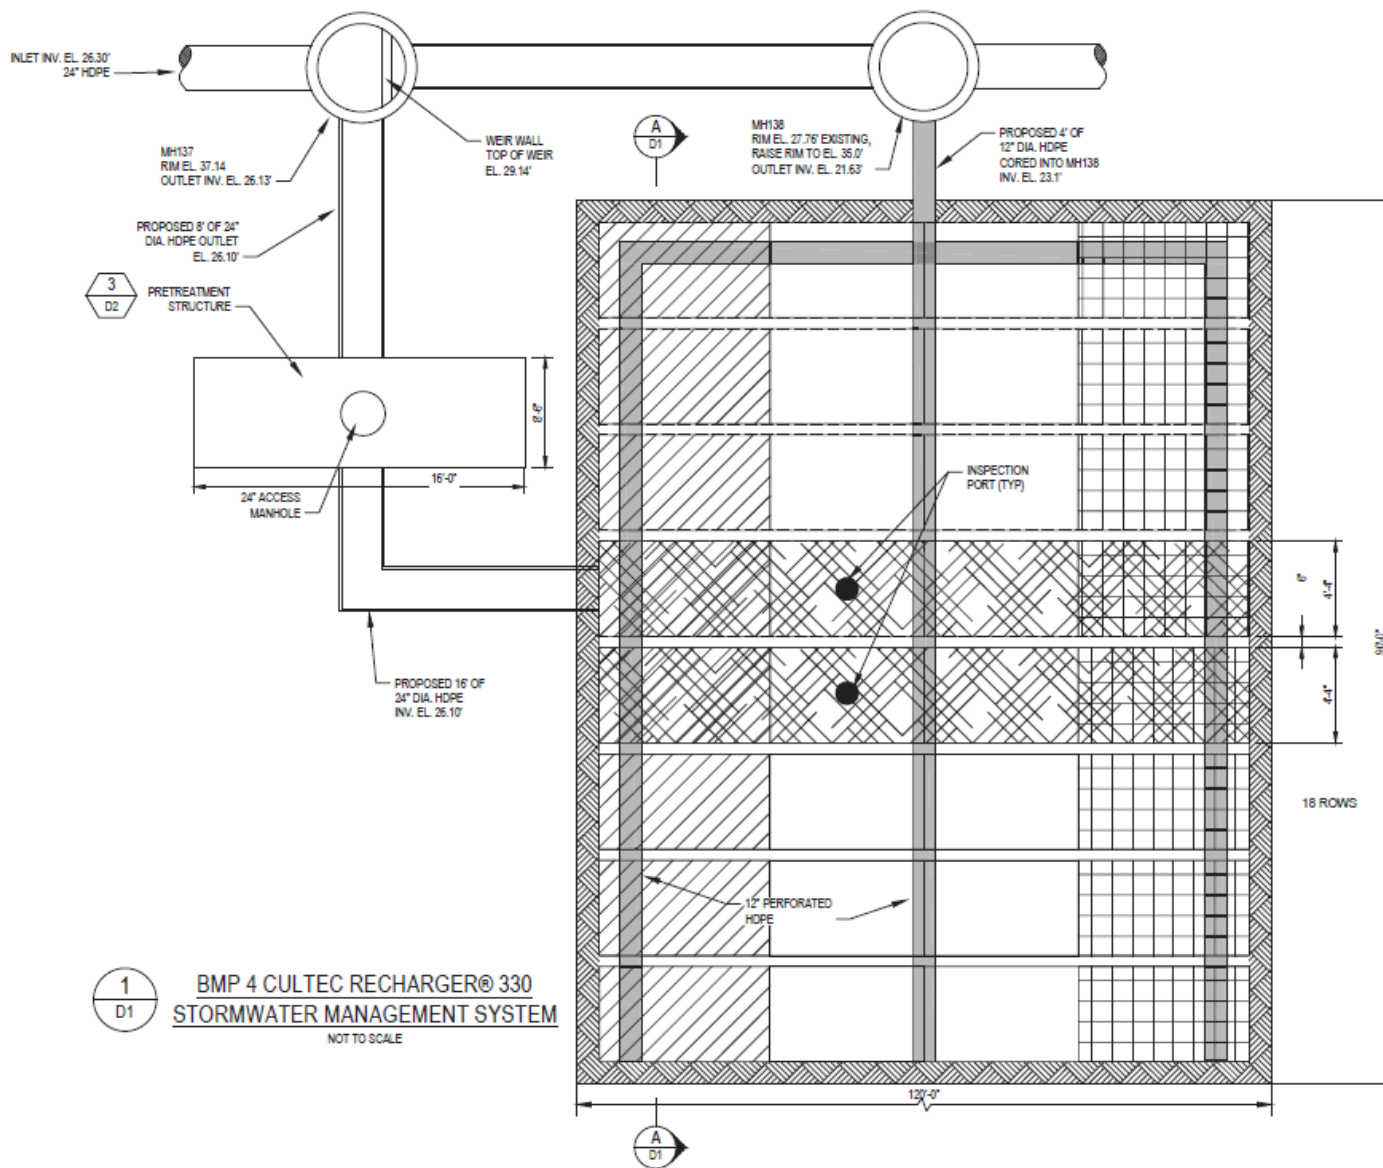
Engineering Plan View Detail for Subsurface Infiltration BMP 4
